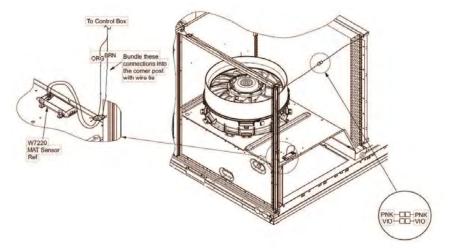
Mixed Air Sensor Installation W7220 (Vane Axial Fan System)
